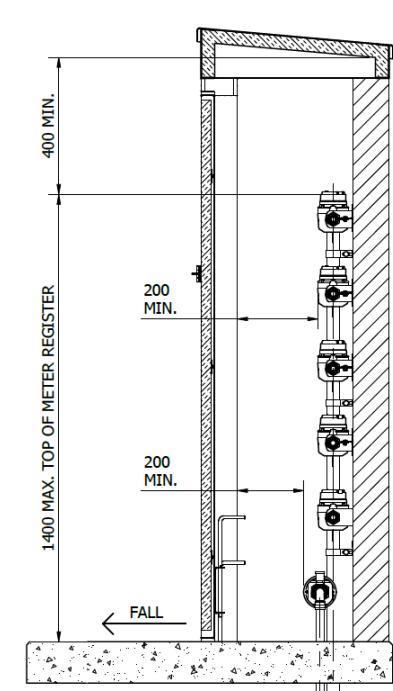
The required clearances in the meter cabinet inside view
